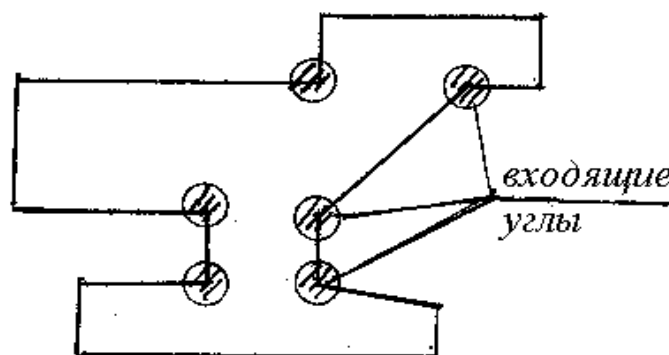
A fragment of a complex plan with dangerous places at the incoming corners of the building
